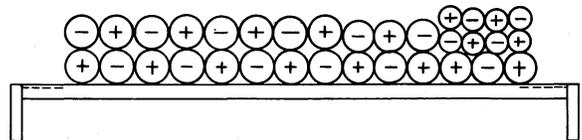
Pairing of Talking Conductors on Cable Rack—Typical Section
